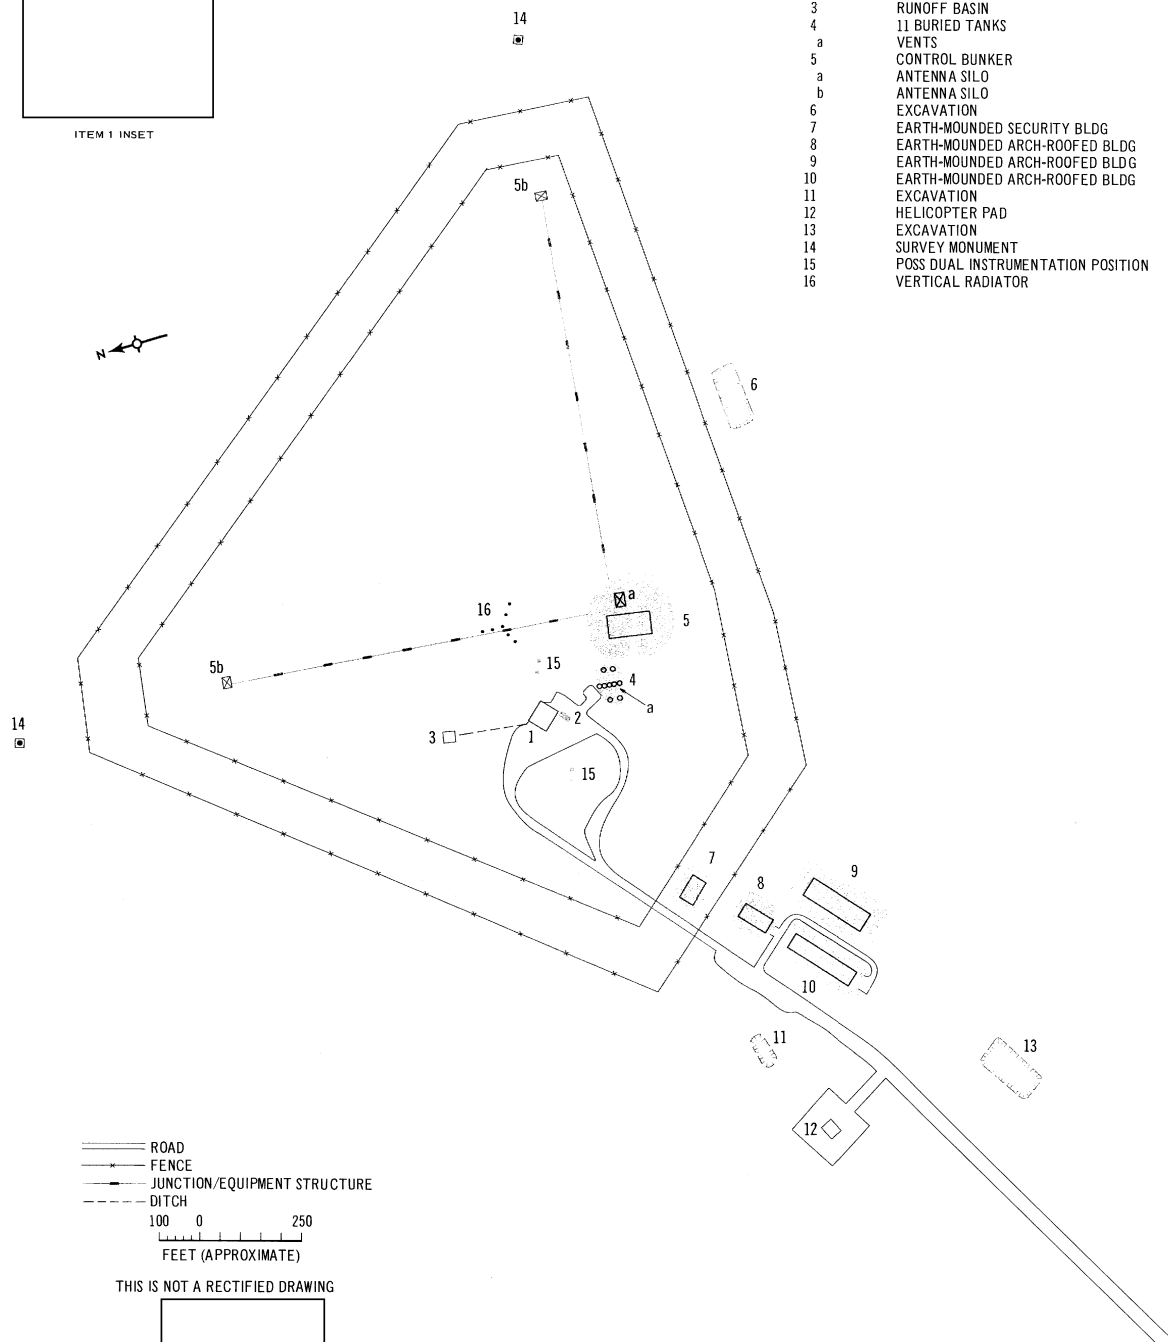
LAYOUT OF LAUNCH SITE 3A, ALEYSK ICBM COMPLEX.
